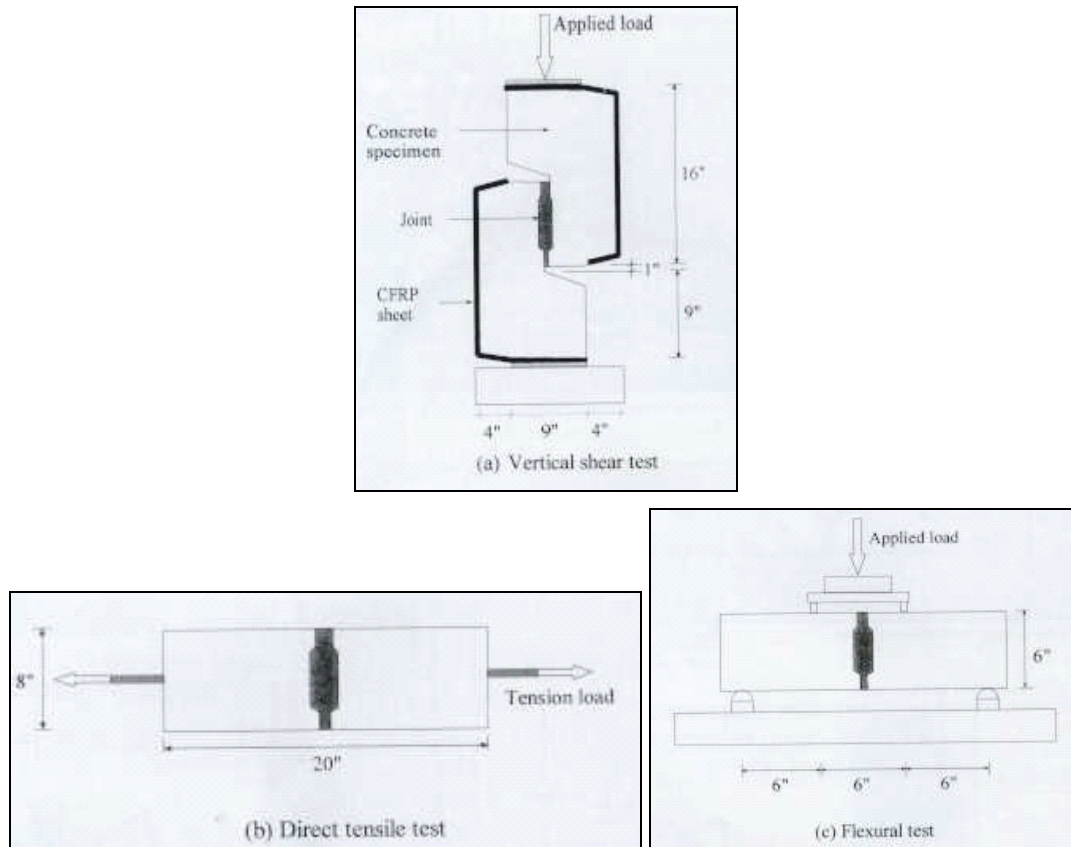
Configuration and test setups of the test specimens (Issa et al 2003)
